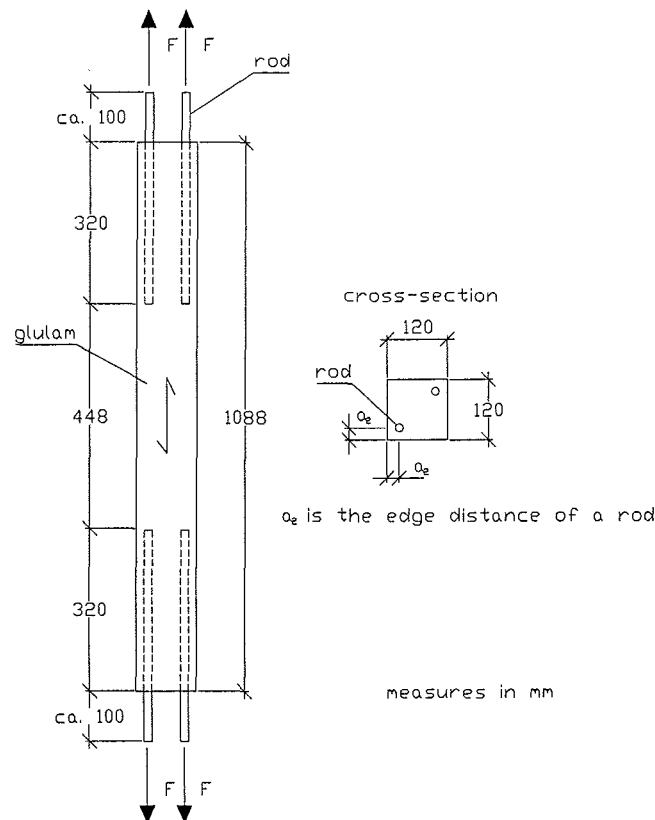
Dimensions, design and loading arrangement of specimens for axial loading (two rods glued-in parallel to the grain)
